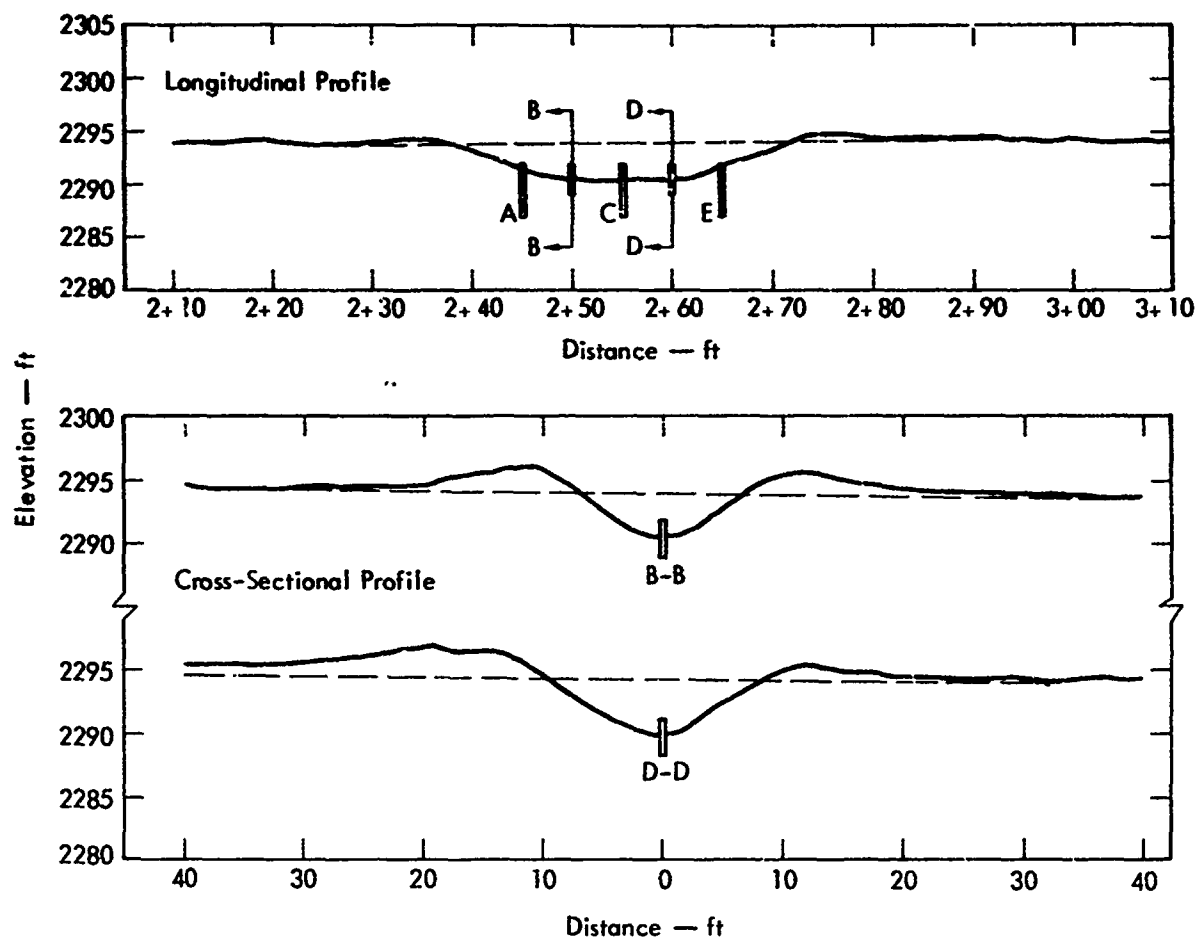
DRC-3 longitudinal and cross-sectional profiles.
